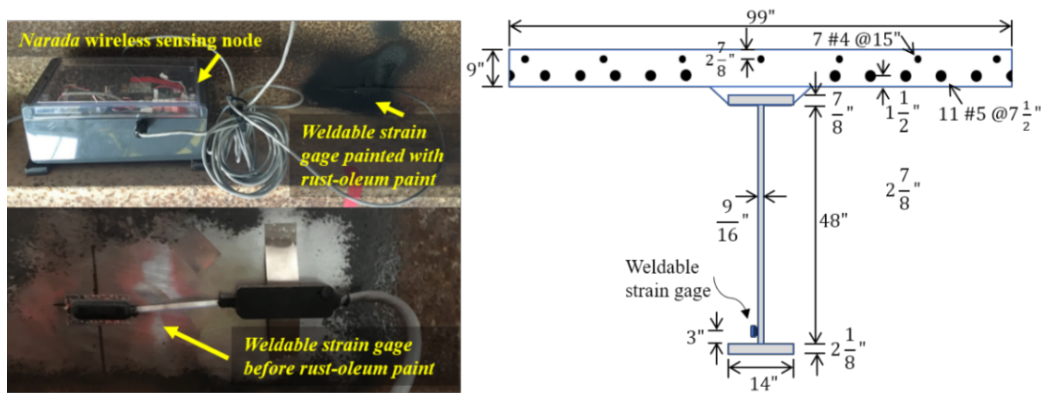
(left) Strain gage installation on the Newburg Road Bridge; (right) cross section of an interior girder with dimension and sensor location illustrated.
